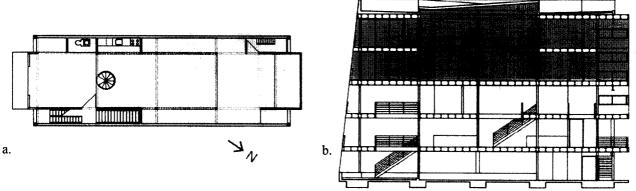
1022 Natoma: a) Plan of architectural office on top levels, b) Section with study area shaded
